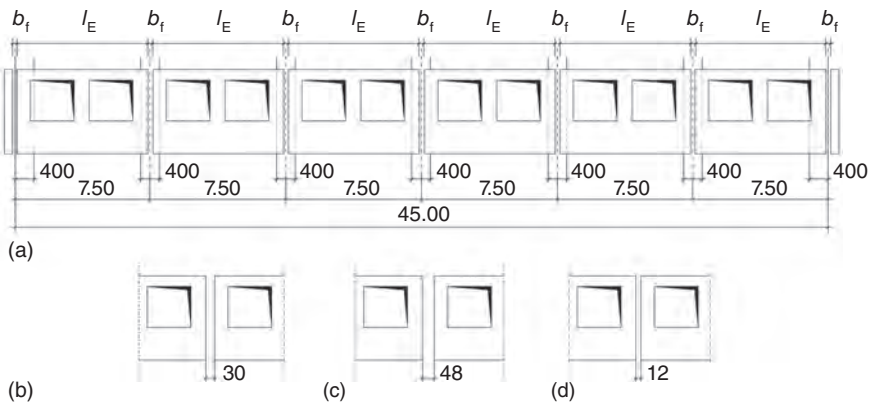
Joint widths without prior measurement on site: (a) elevation on and dimensions of façade, (b) nominal joint width, (c) maximum joint width, and (d) minimum joint width. Source: Taken from Ref. [5].
